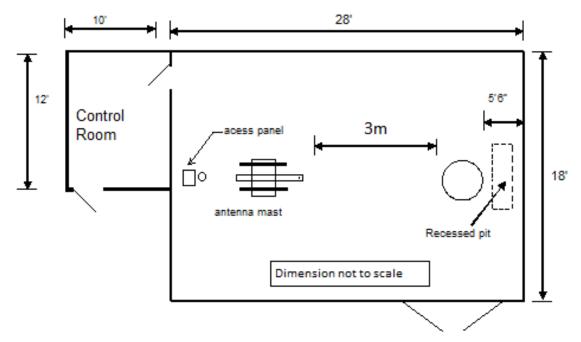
Semi-Anechoic Chamber Test Site
